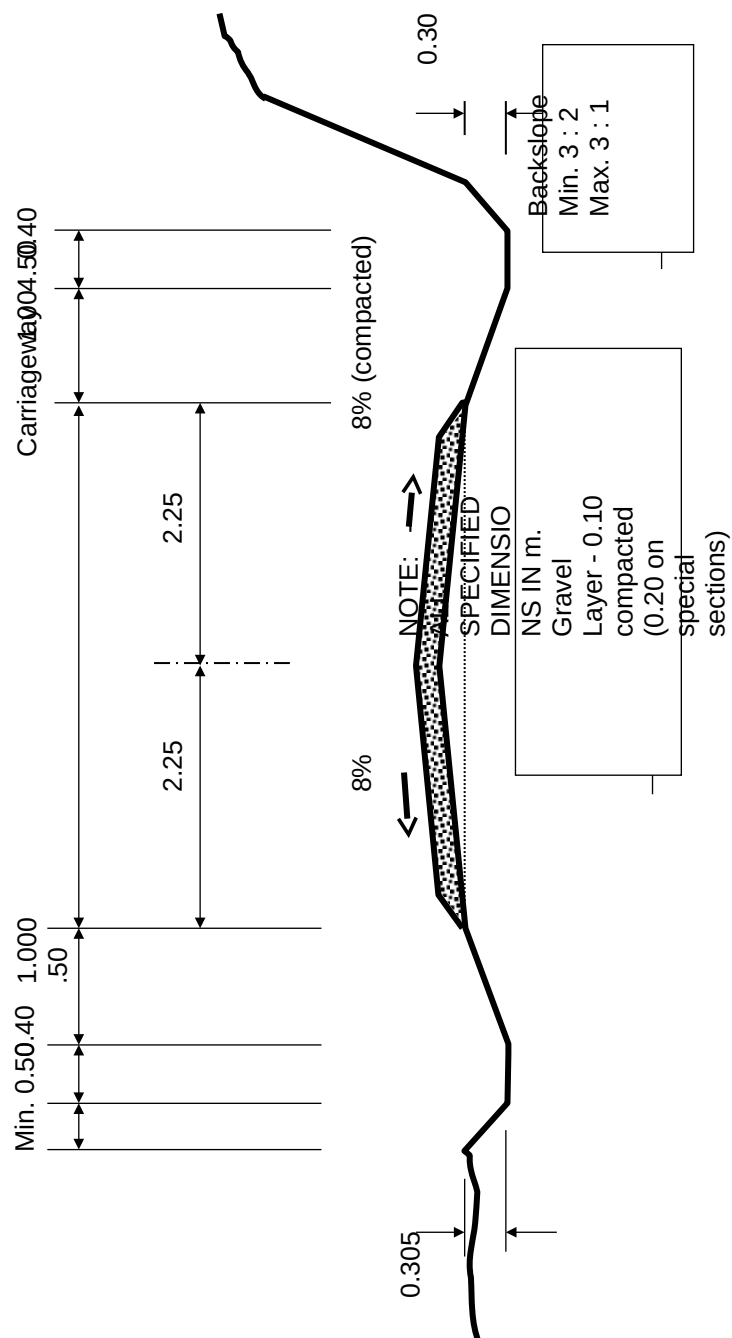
CROSS SECTION B (REDUCED CROSS-SECTION)
